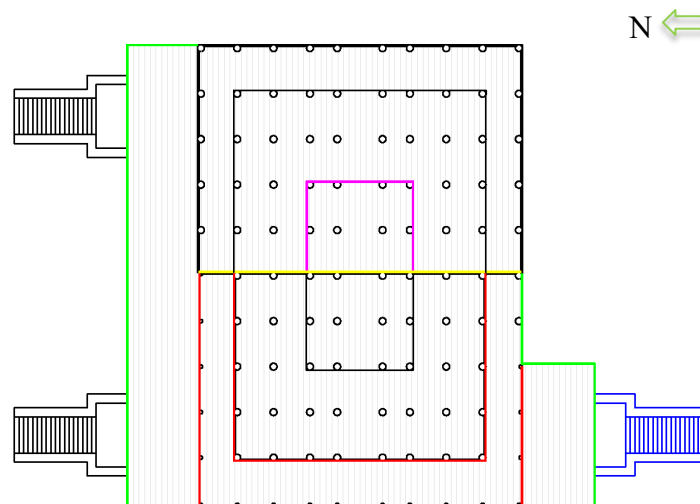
Location of veranda handrails, wood carvings and staircase. Source: Drawn by author, 2022.
